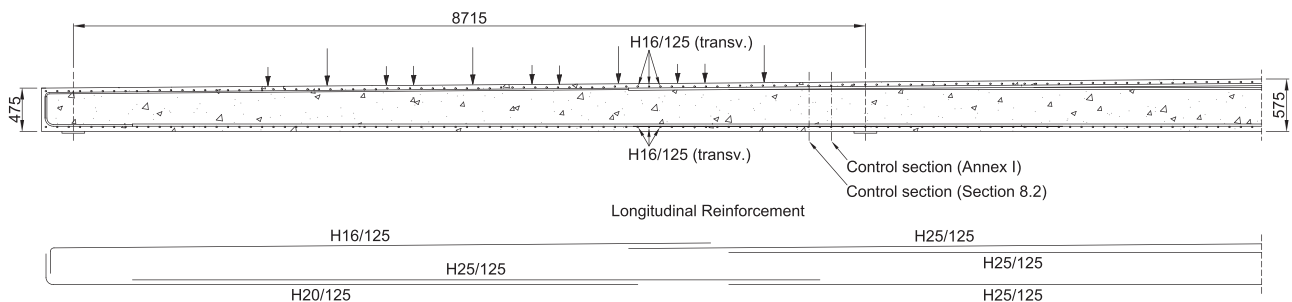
Castle Mill Stream underbridge: flexural reinforcement of half deck with illustrative locations of point loads and control sections [mm].
